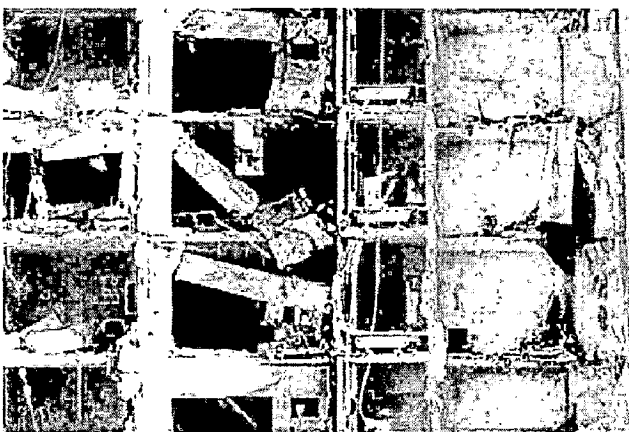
an exterior envelope failure as a result of direct air-blast effects.
